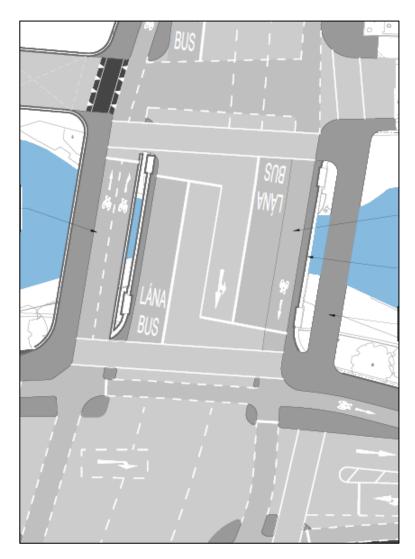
Proposed footbridges on both sides of Robert Emmett Bridge
